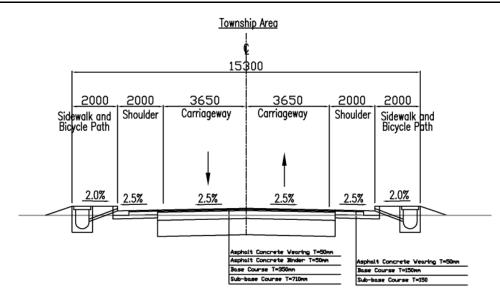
Typical Cross-section in Township Area of Asutsuare-Aveyime Road
